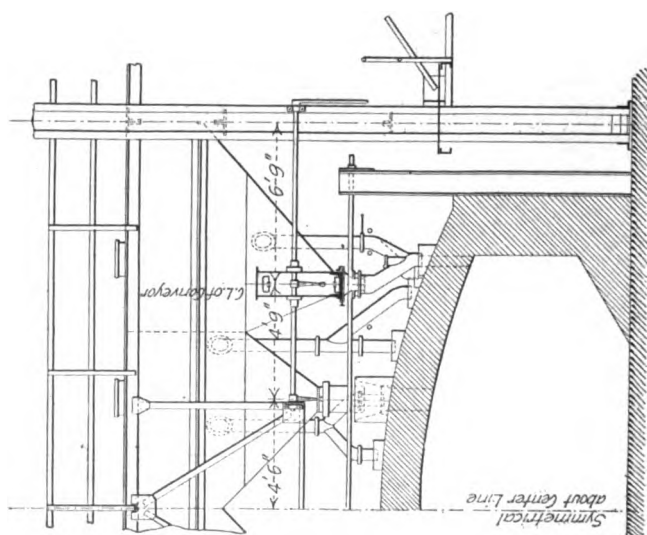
SECTION REVERBERATORY FURNACE SHOWING CHARGING ARRANGEMENT.
